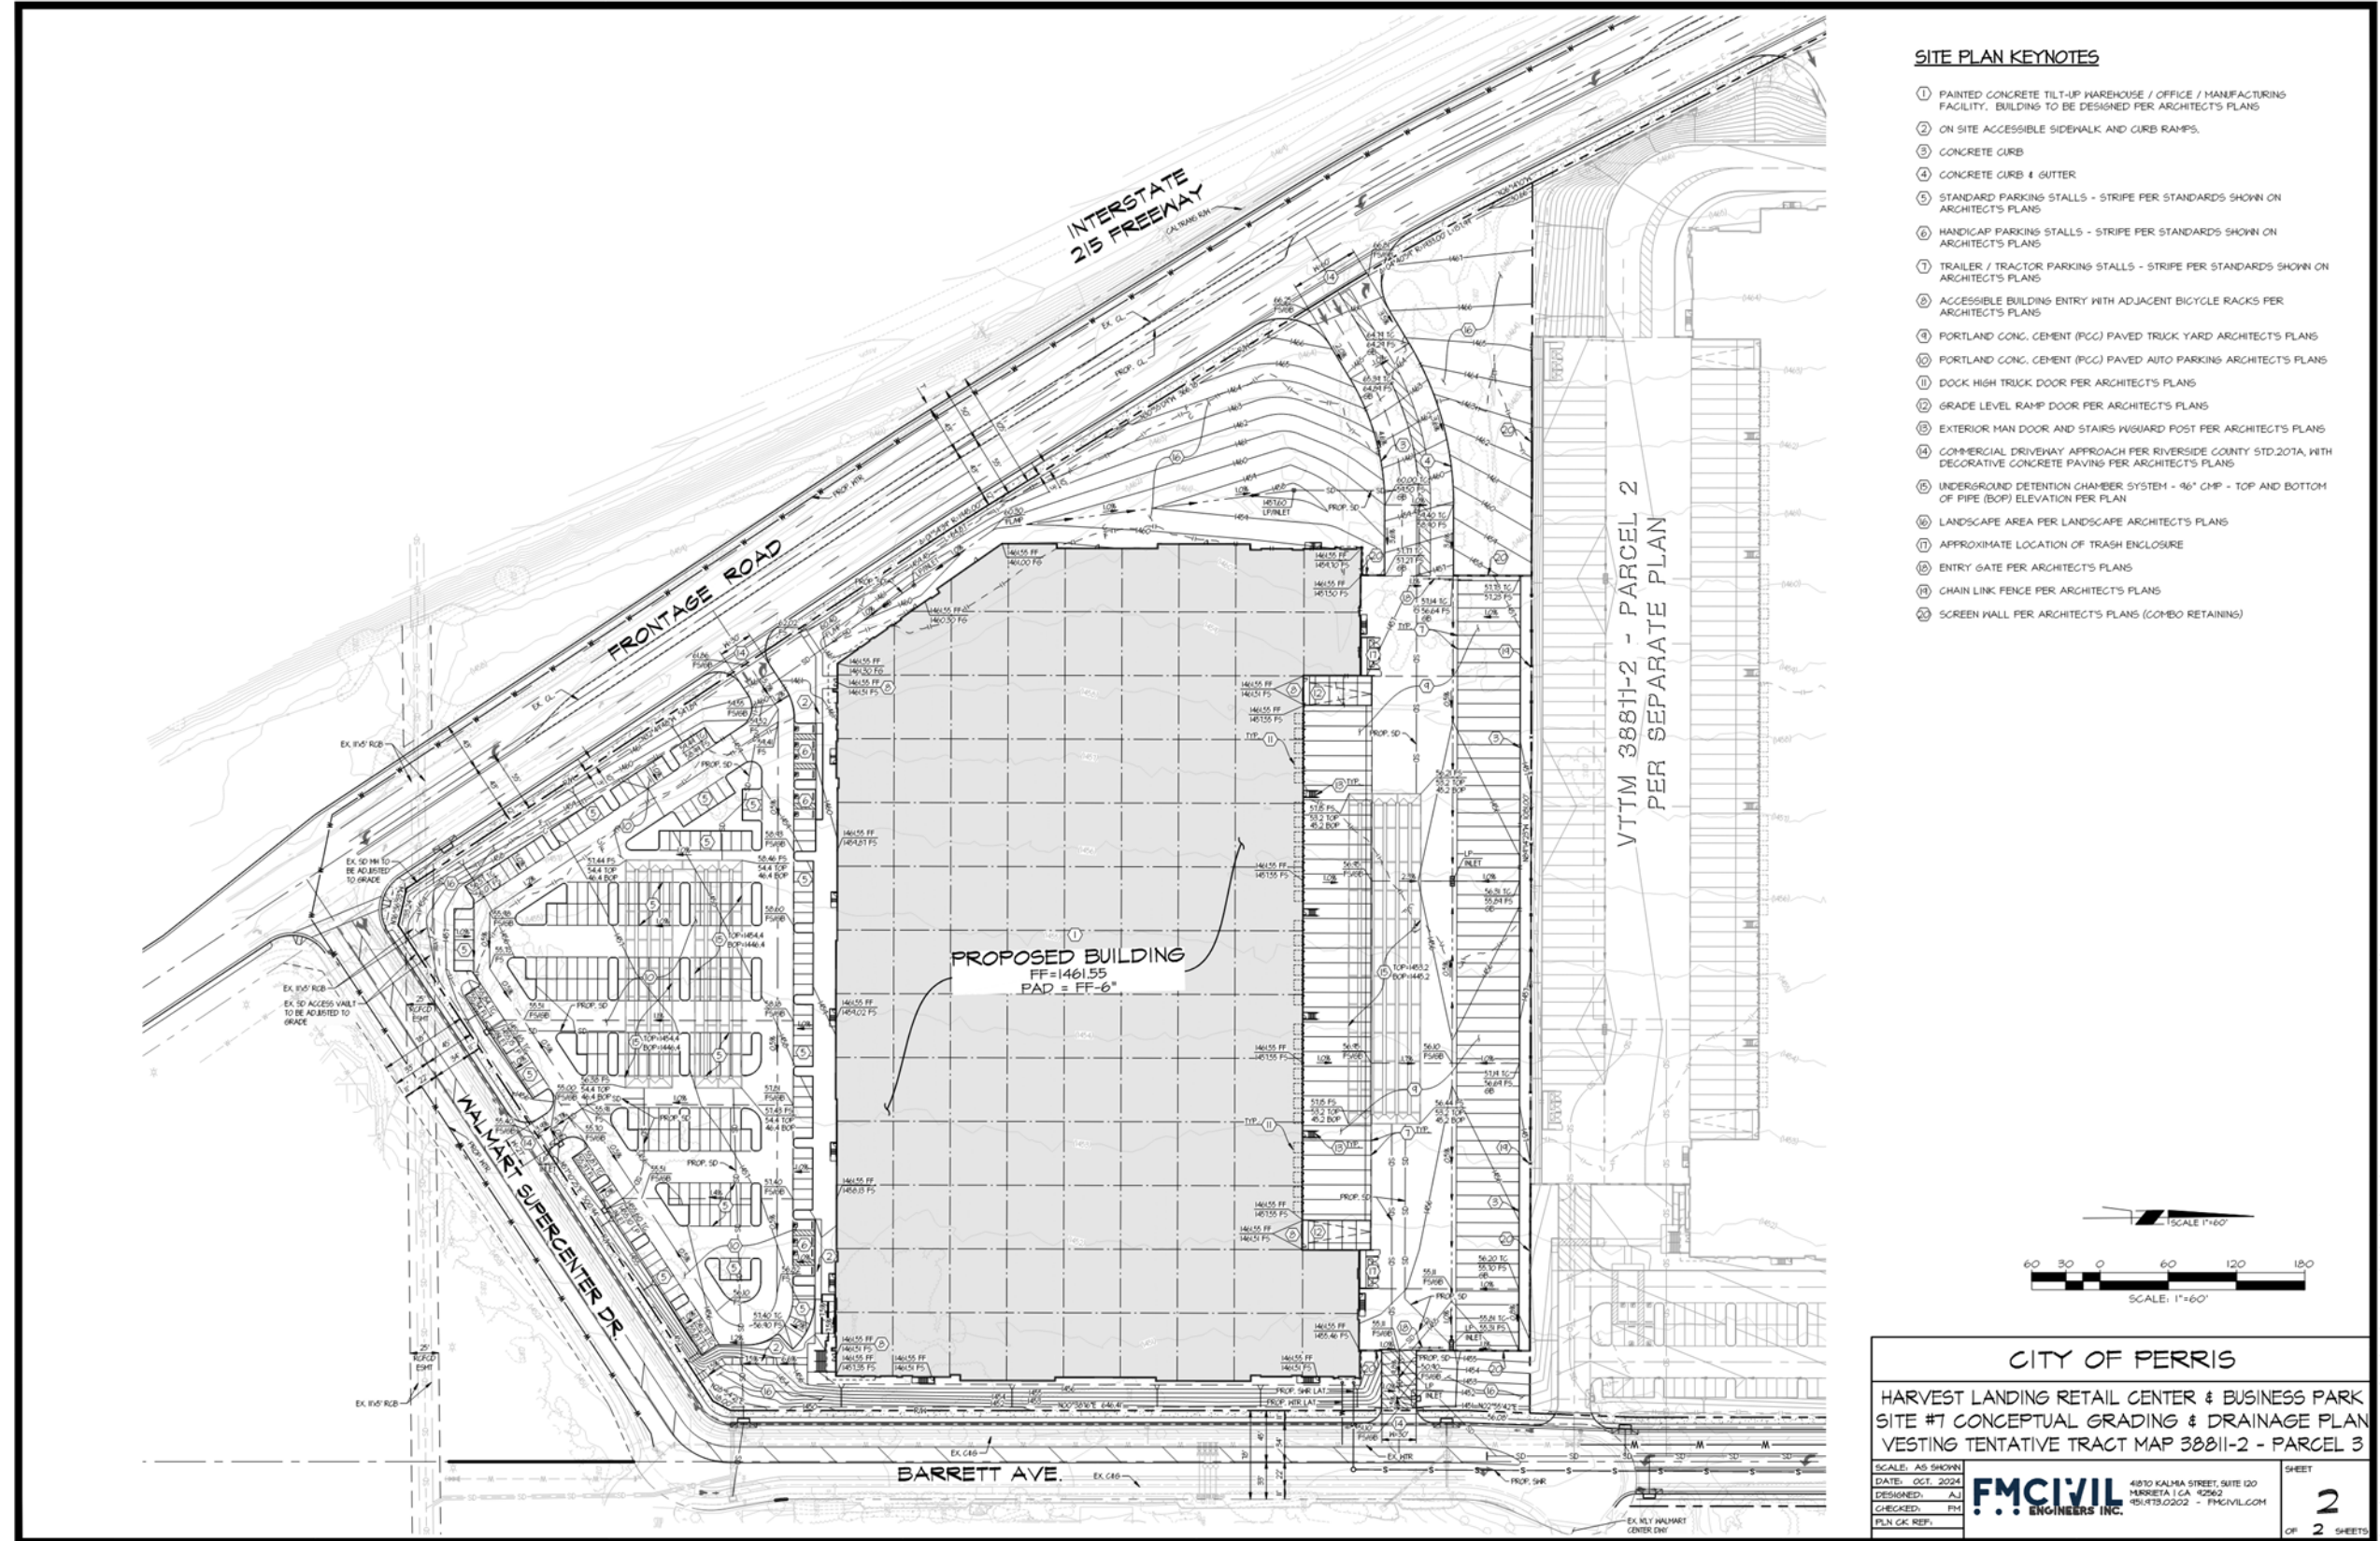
Project Site Plan – Southern Commercial Parcel
